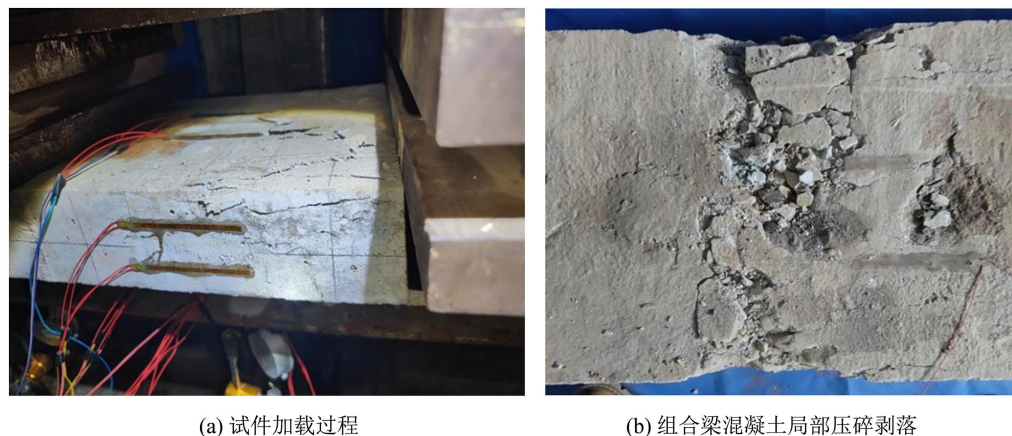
Specimen loading process and local concrete crushing and spalling
